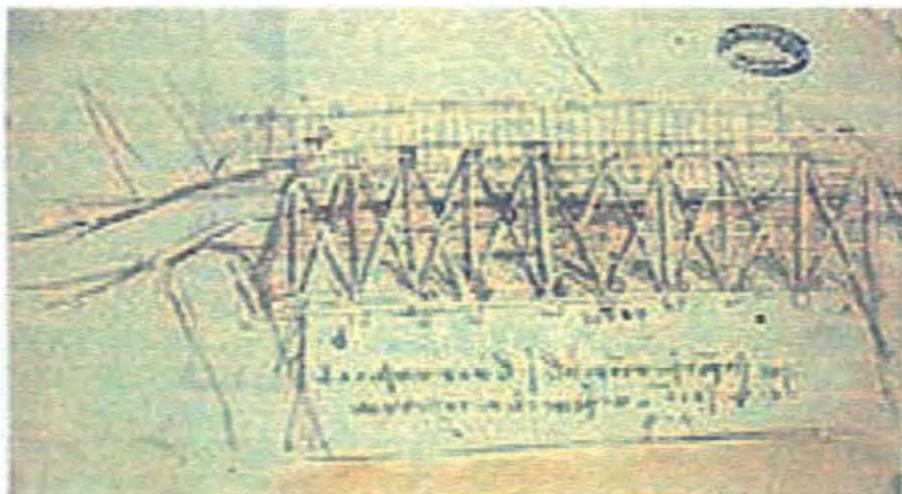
A drawing of a truss bridge from Leonardo da Vinci's Notebook.
